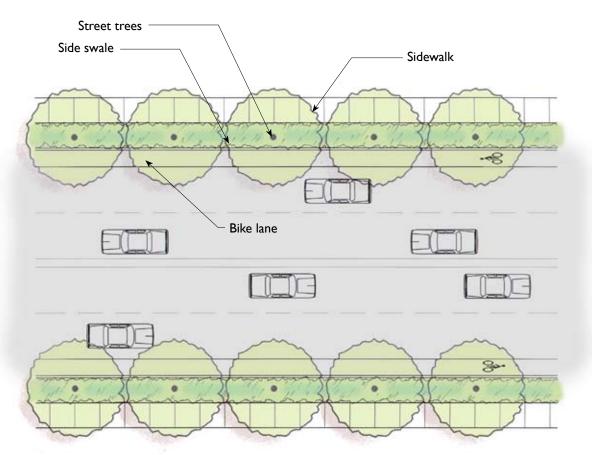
Side Swales on a Multi-Lane Arterial-Plan View
